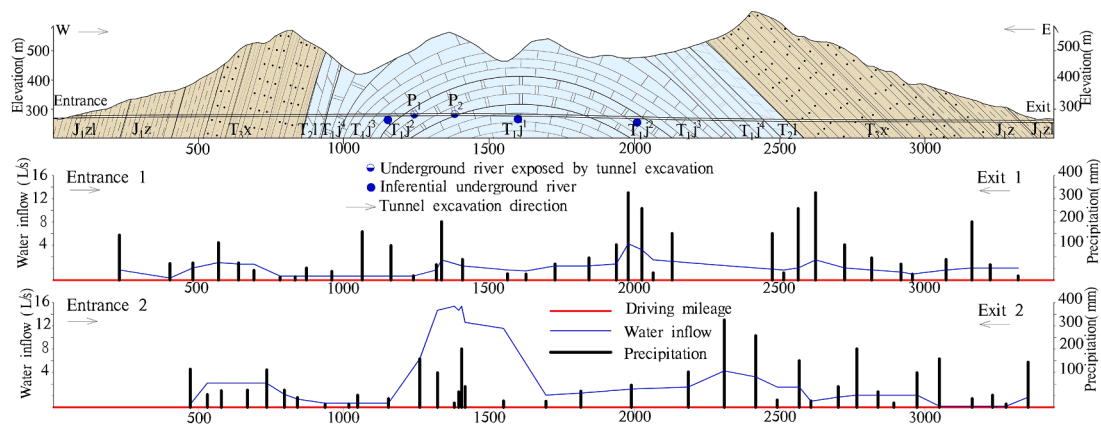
Geological section of the Mingyue Tunnels and water inflow during tunnel excavation.
